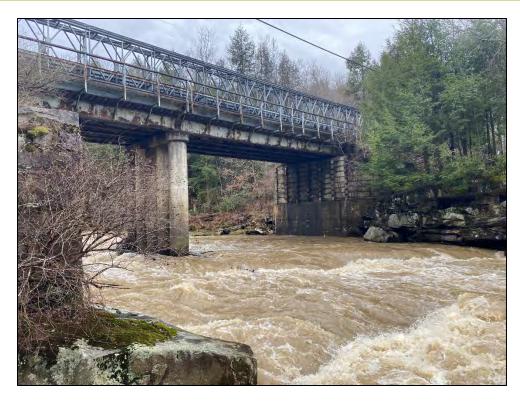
View of the Swallow Falls Road Bridge from the eastern bank of Youghiogheny River, north of Swallow Falls Road. Visible are the abandoned stone abutment (left), the existing in-river center pier, and concrete abutment of the bridge (right).
